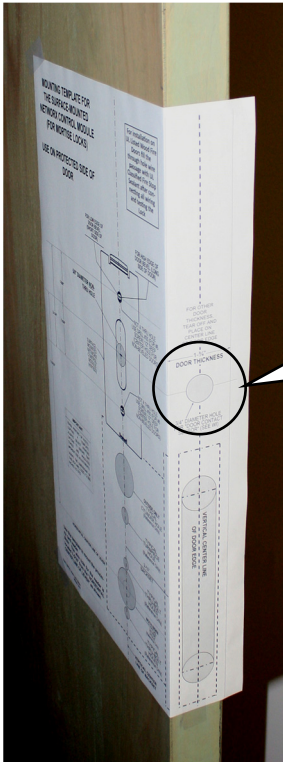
DOOR CONTACT SENSOR HOLE ON DOOR EDGE
